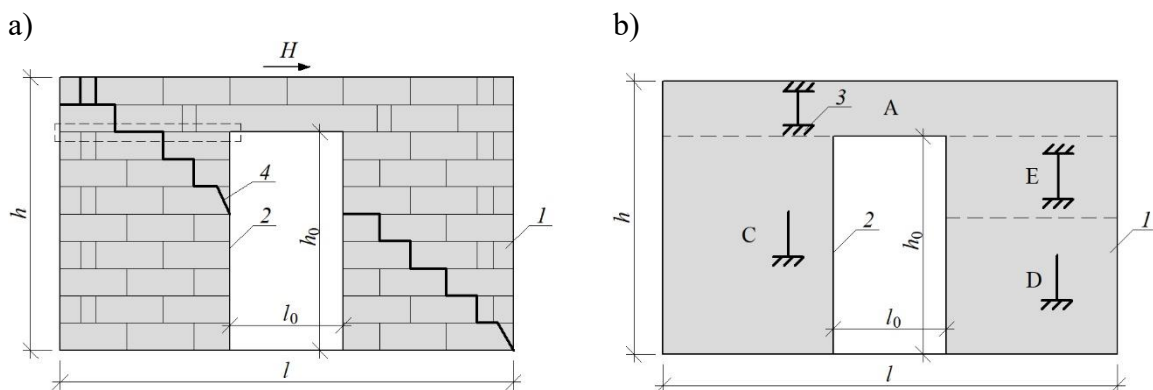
Division of the wall into components: a) cracked wall, b) calculation model: 1 – masonry wall, 2 – door opening, 3 – static scheme, 4 – cracks
